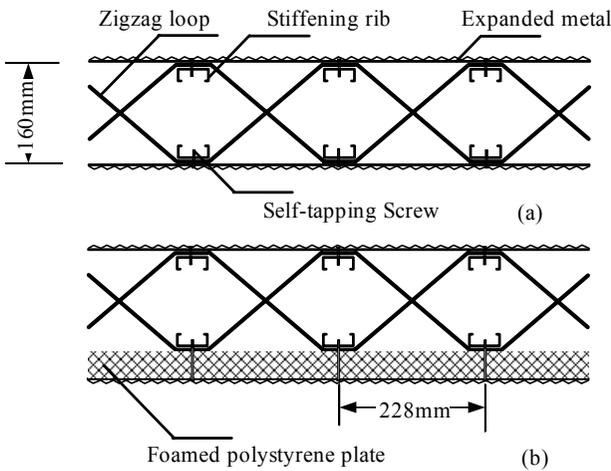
Detail of Dipy construction formwork (a. standard; b. heat insulation)
